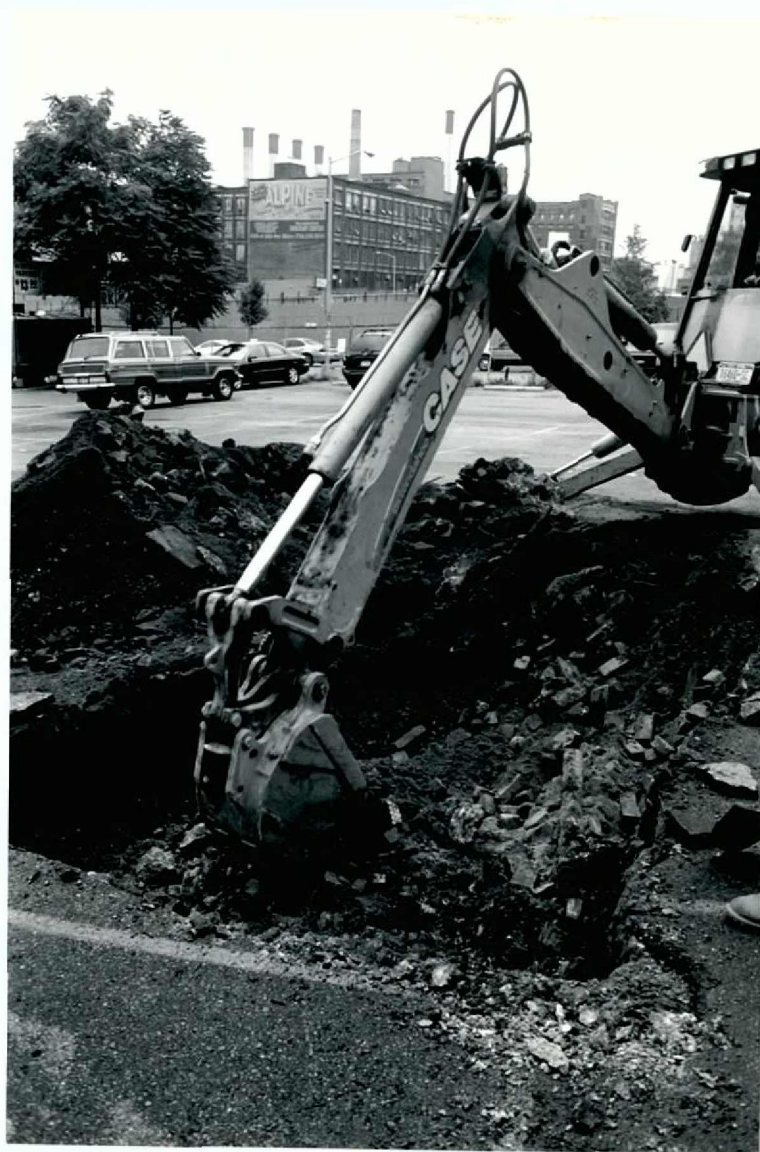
View of excavation of Backhoe Trench 1 looking northeast.
